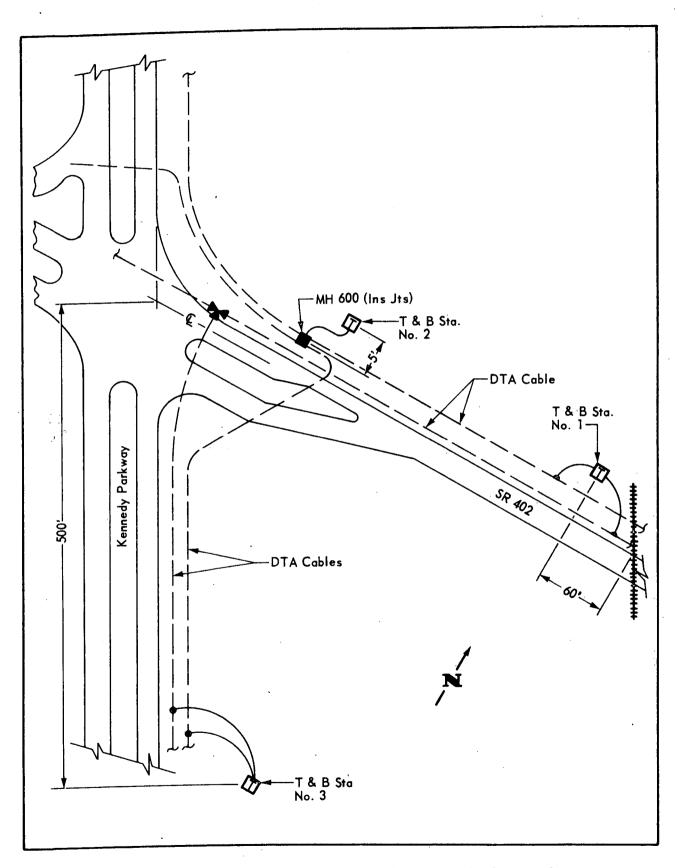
Test and Bond Stations No. 1, 2, and 3
